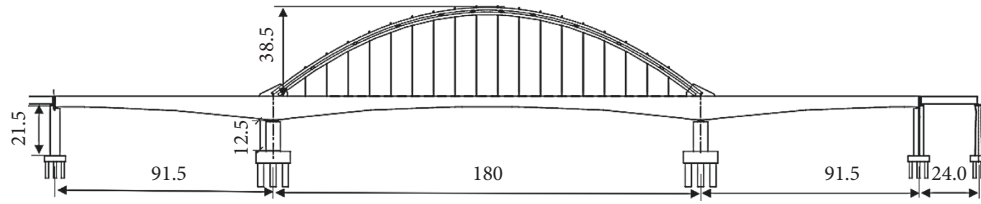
The overall size of the Chengjiang bridge (unit: m).
